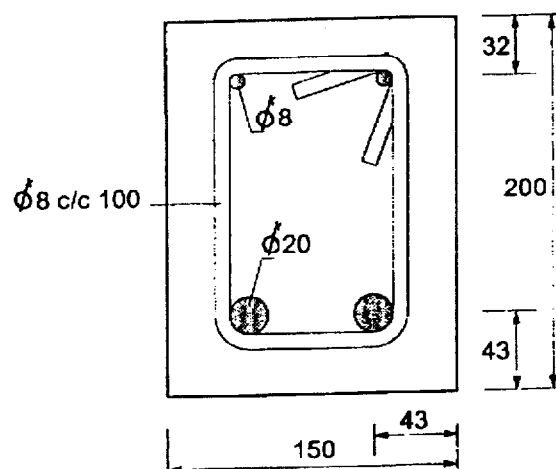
Cross section of typical test beam (21,31,32,41,42,51,52)
